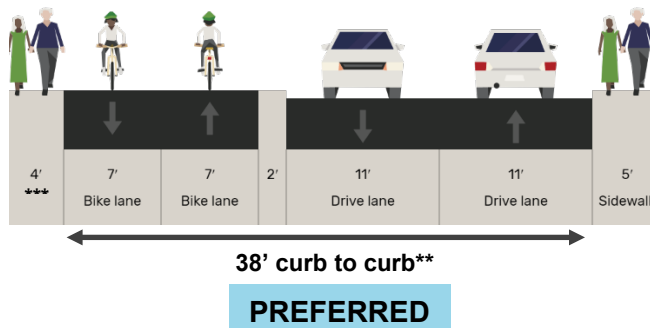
Section C (Butler Street - 62nd Street to One Wild Place) – Proposed Option 1
